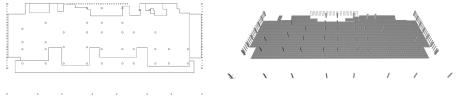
Slabs and columns on plan (left) and generated slabs columns (right).
